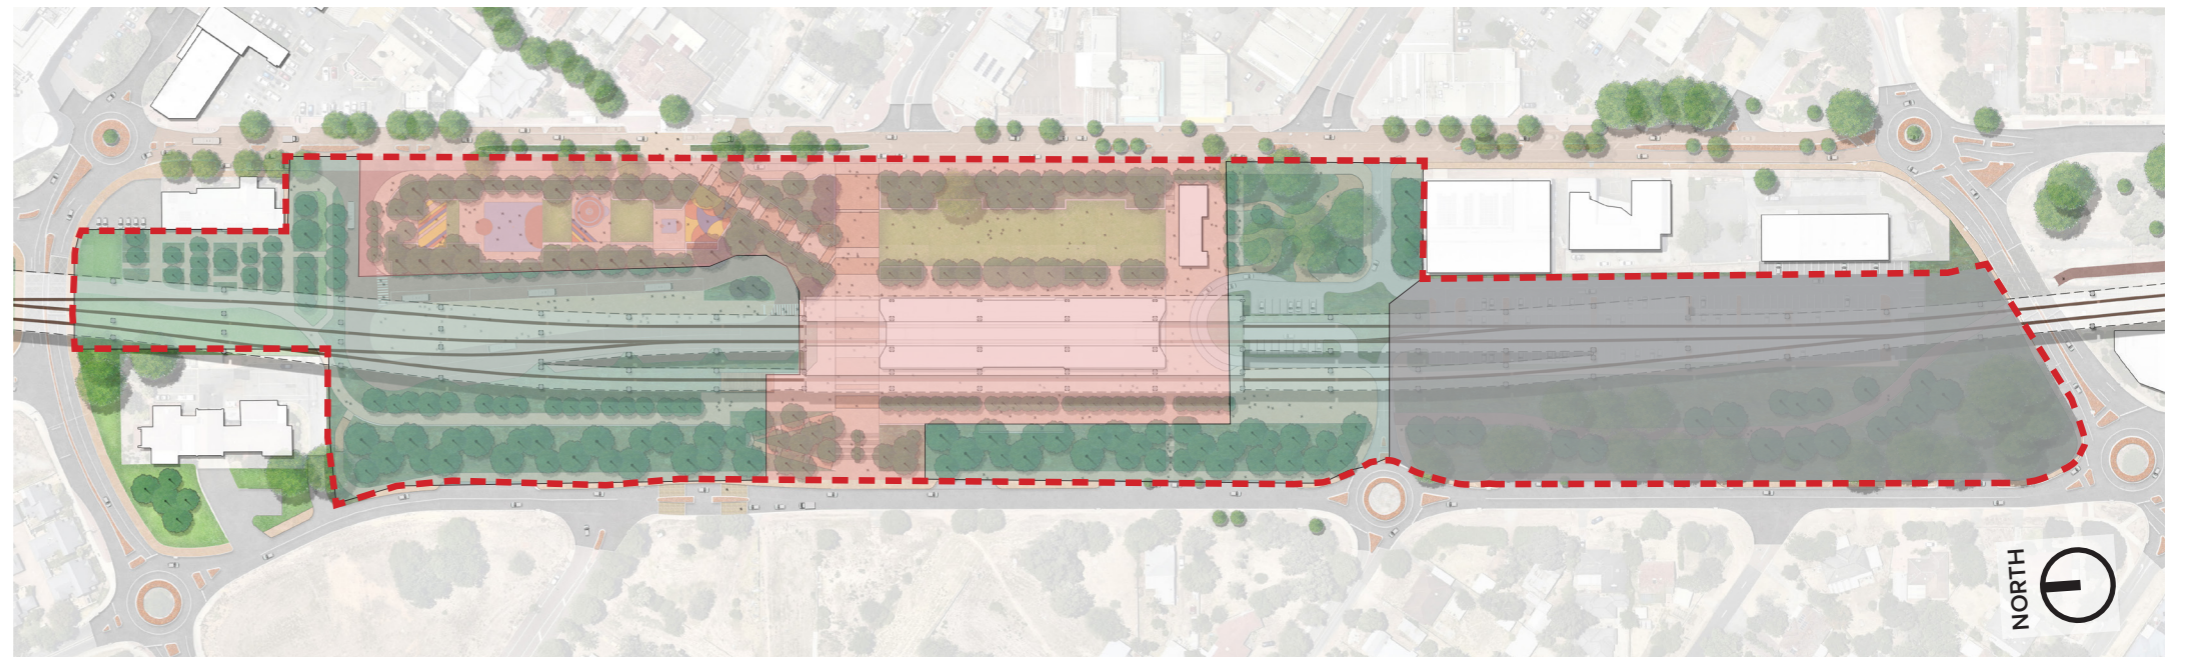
INVESTMENT LEVELS PLAN – SOUTH OF FORREST ROAD
